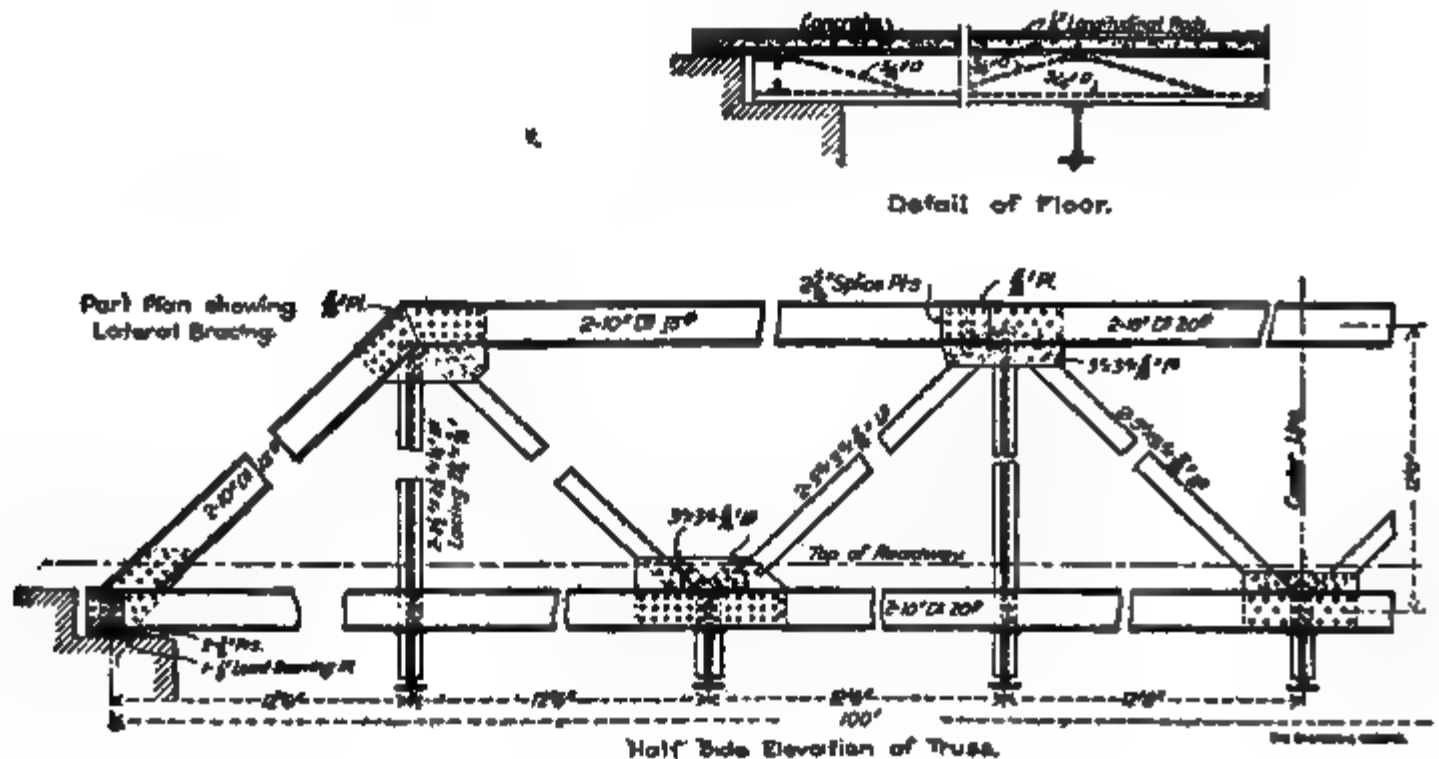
ELEVATION OF RIVETED HIGHWAY BRIDGE, PORTAGE COUNTY, OHIO.
